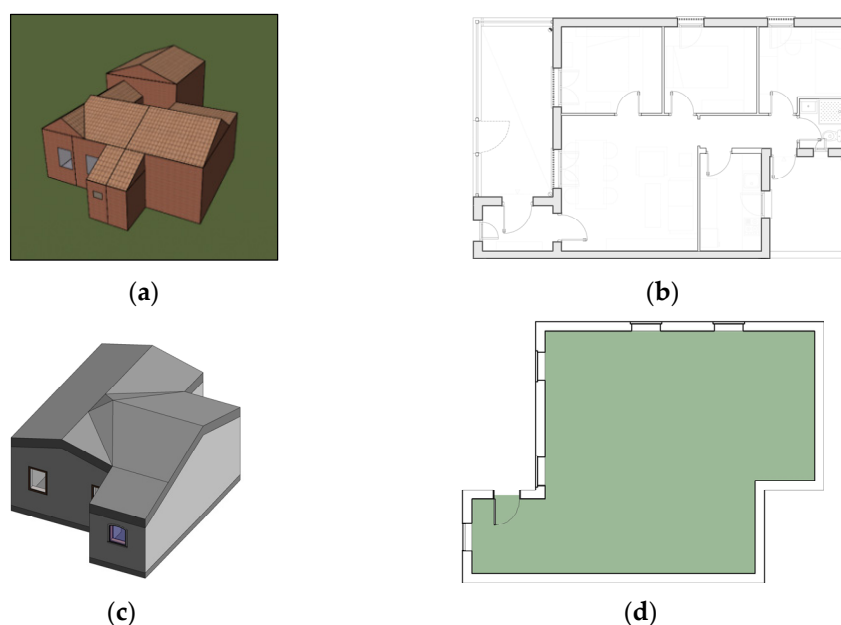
Madrid demo site: (a) detailed BEM model 3D; (b) detailed plan zone_0; (c) Simplified model; (d) Simplified plan zone_0.
